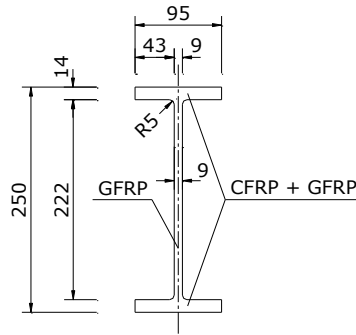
Dimensions of HFRP I-beams (unit: mm)
